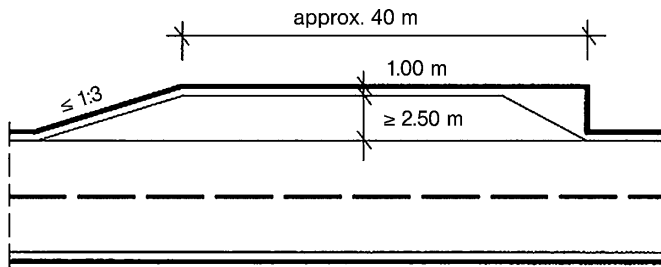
Dimensions of a breakdown bay next to a carriageway [77].
